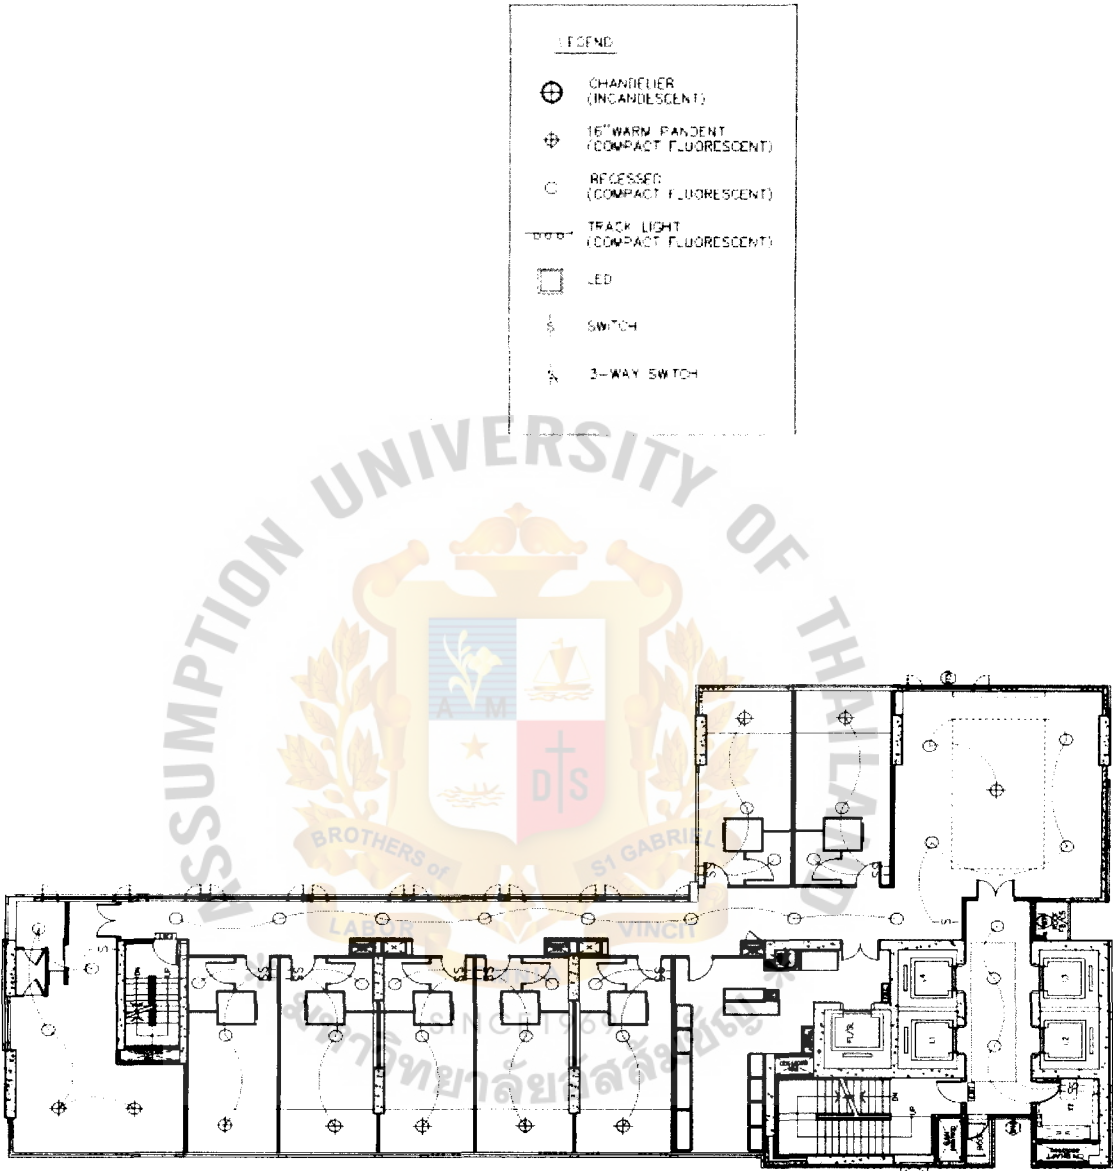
Reflected Ceiling and Lighting Plan of 28th floor plan
